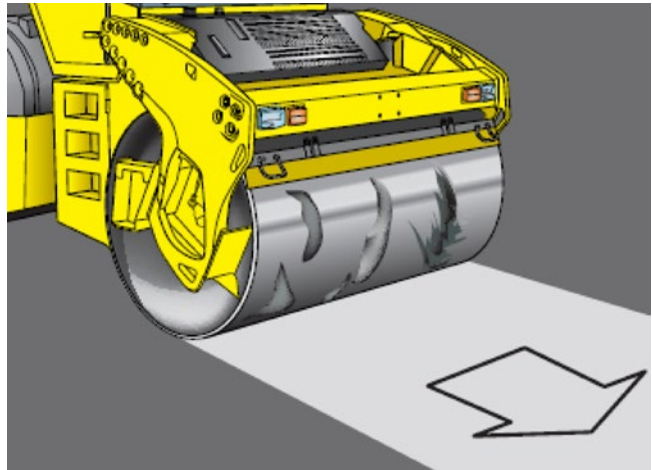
Adhesion of hot asphalt mix to the drum [5]
